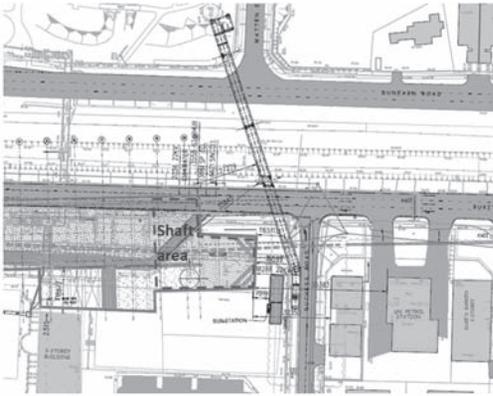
Plan view of Tan Tah Kee TBM launching shaft.
